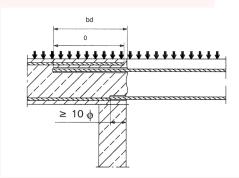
End anchoring of slabs or beams (e.g. designed as simply supported)
